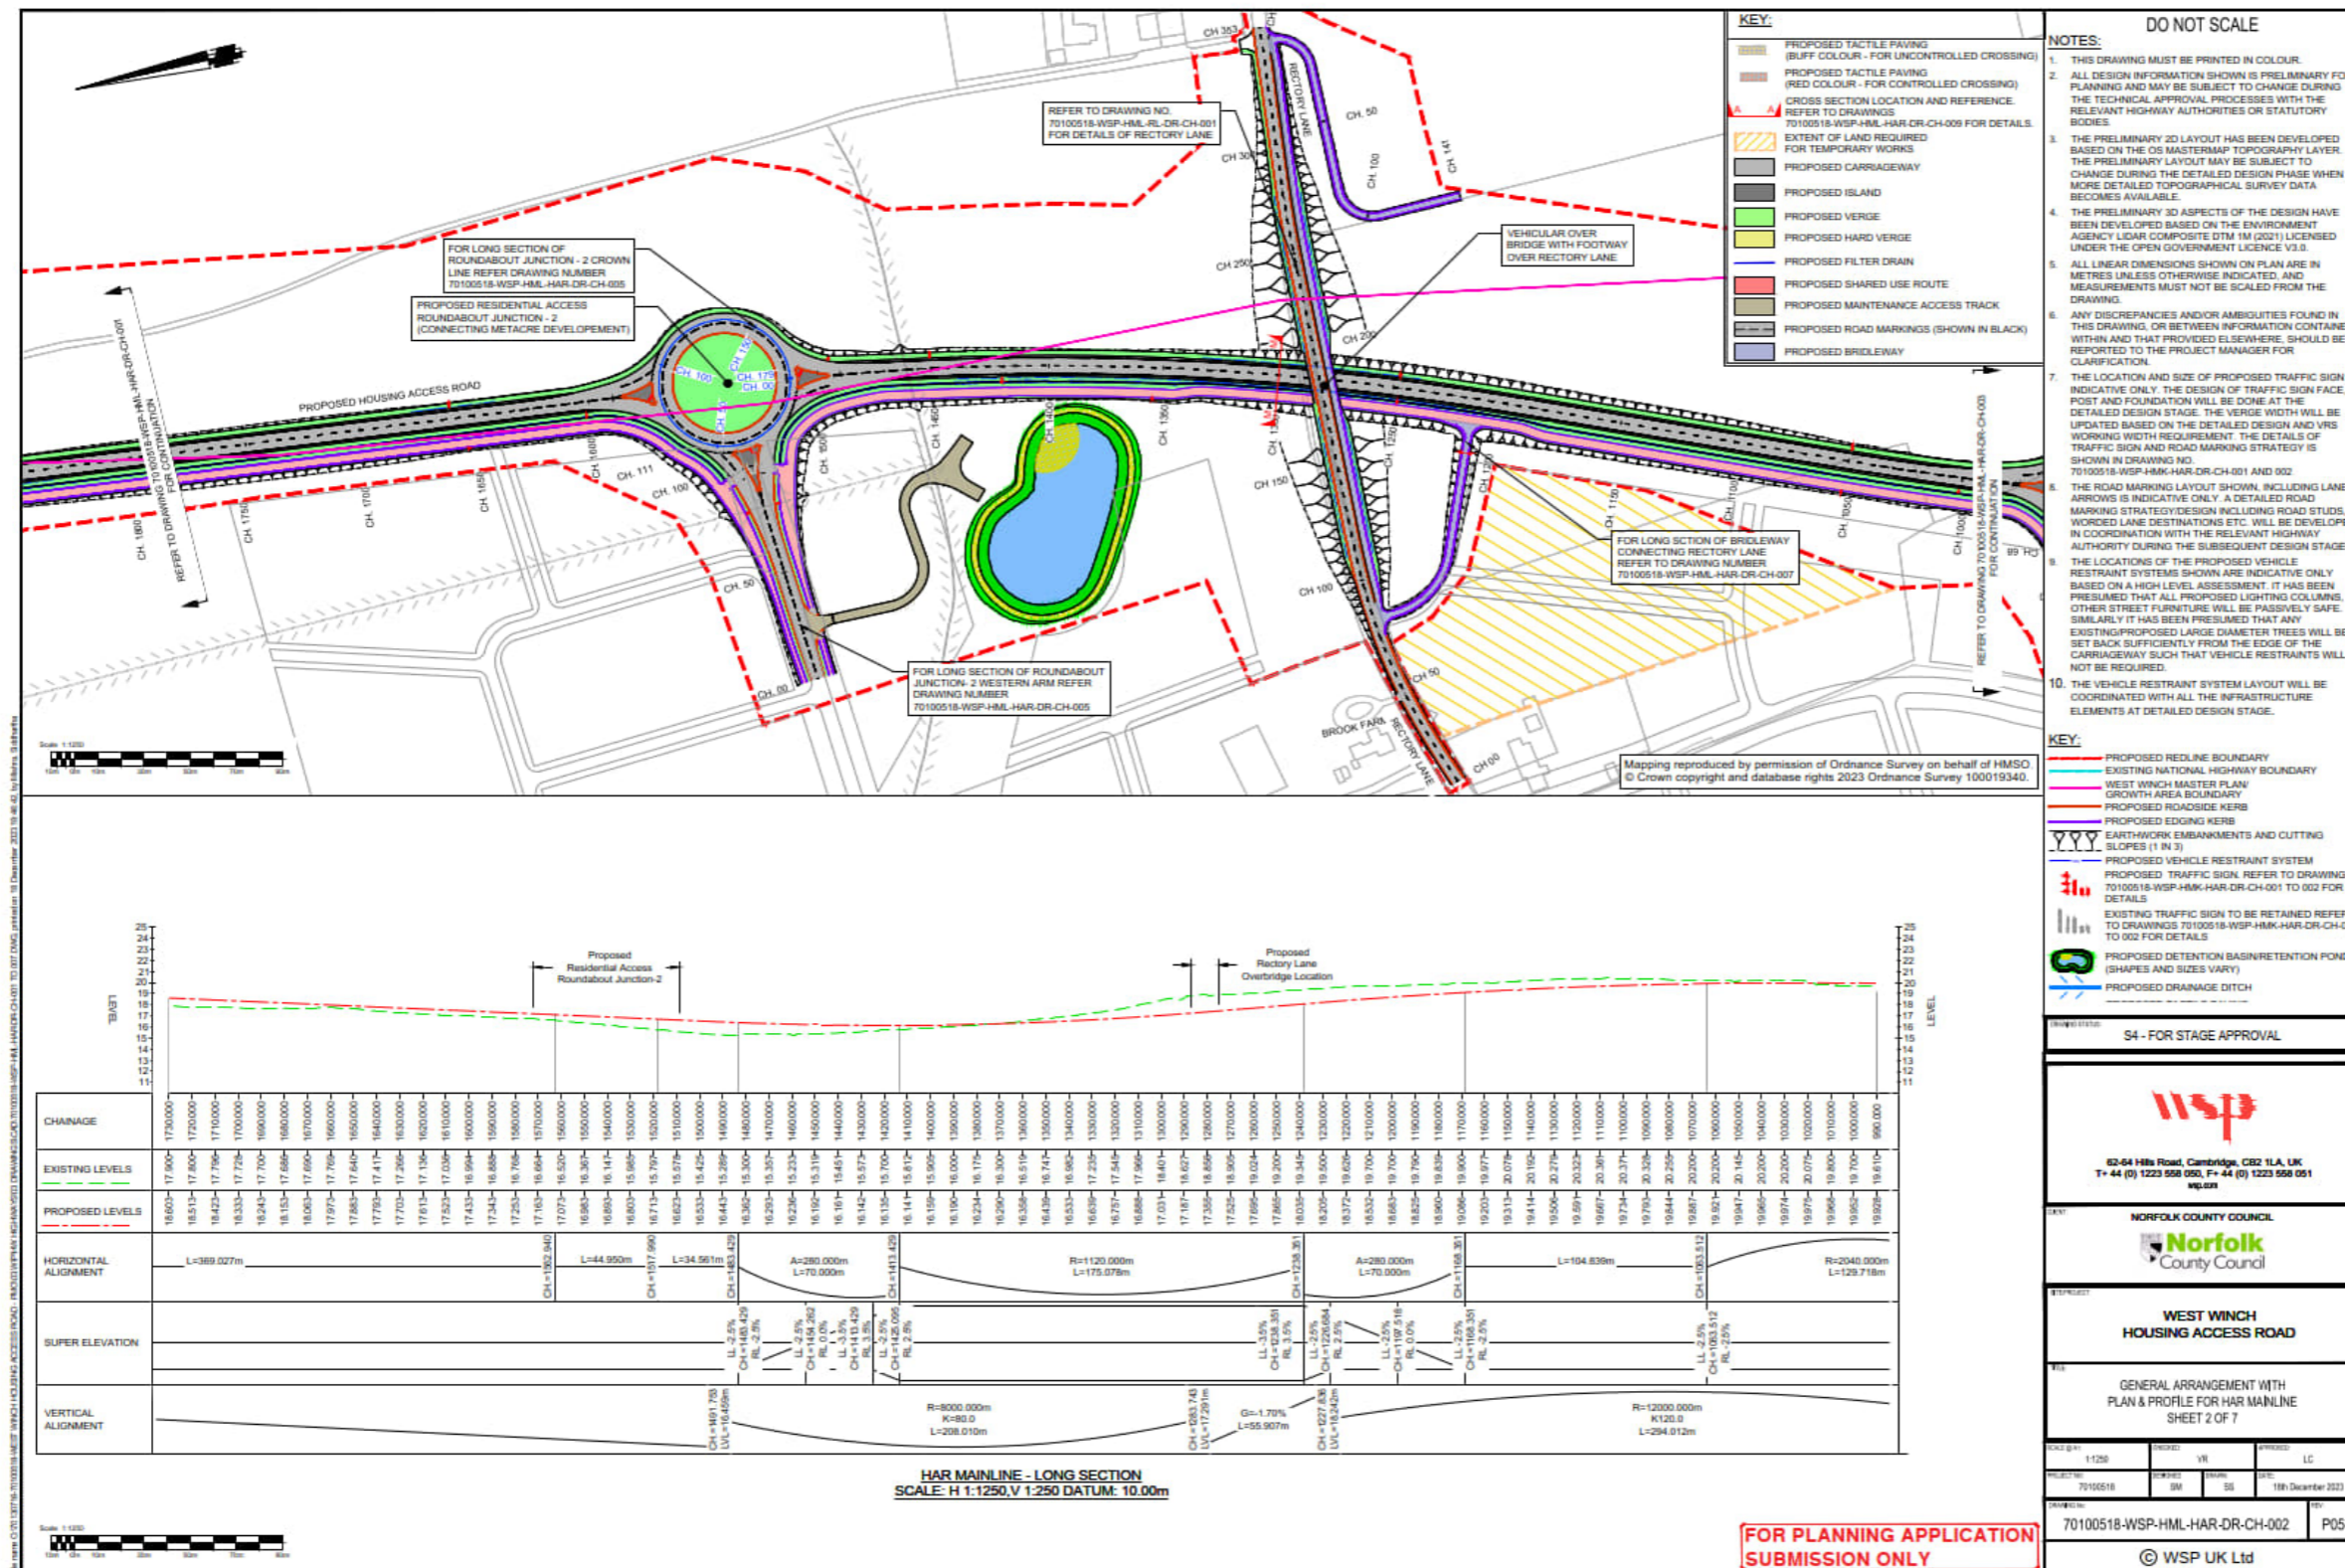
General Arrangement Plan and Profile for HAR (Sheet 3 of 7)
